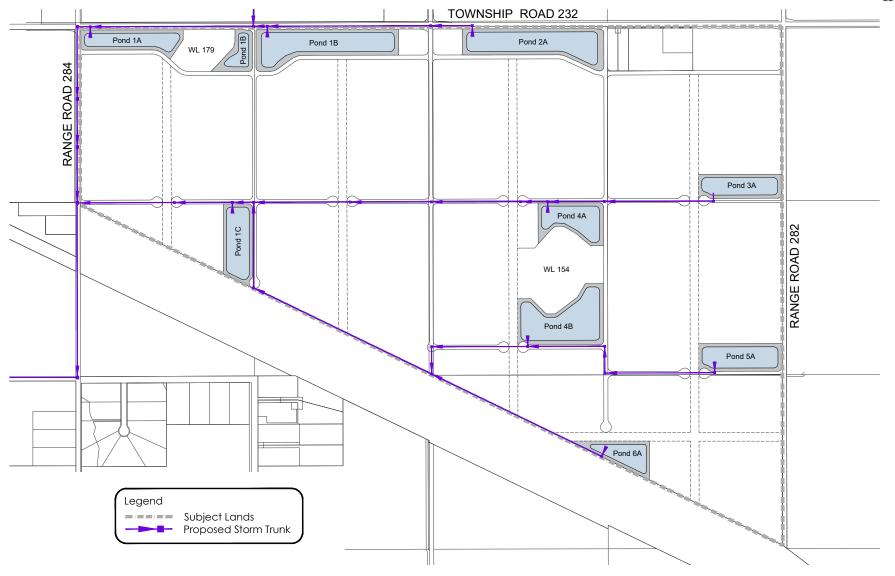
Stormwater Trunk Network (Downstream of Ponds)
